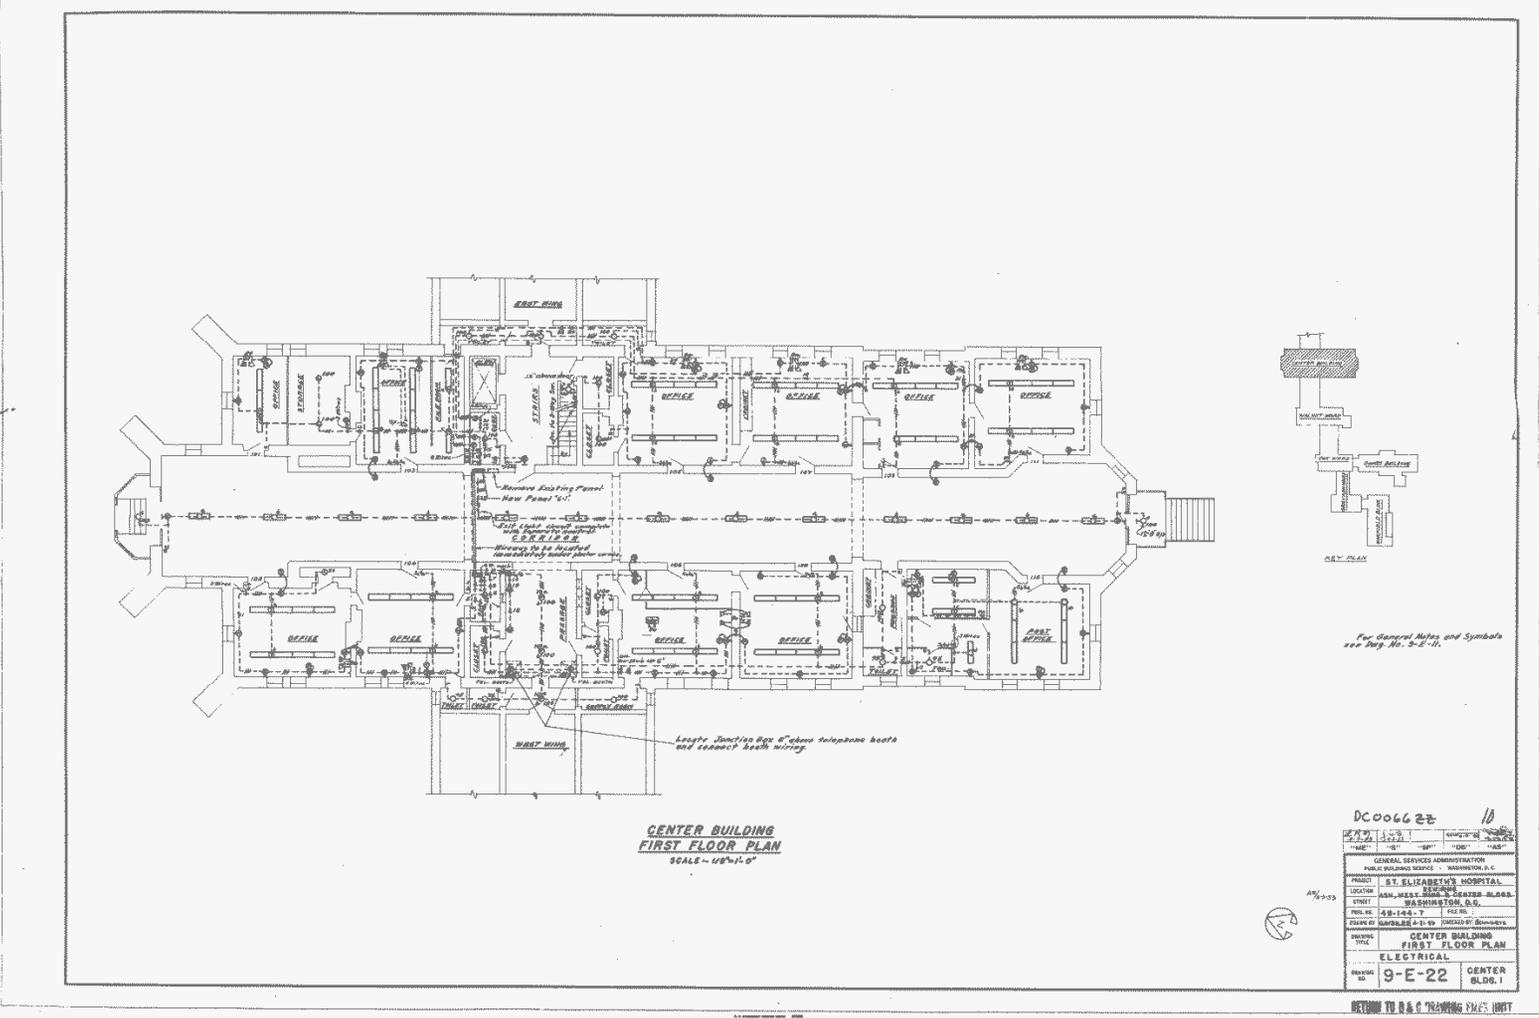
First floor plan of the Center Building outlining improvements to the electrical system, 1953. Source: GSA archives, image DC0066SE0010.
